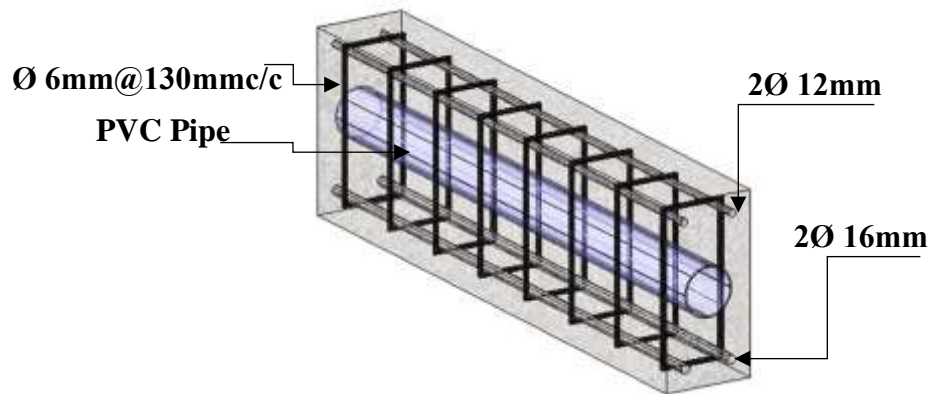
Typical Reinforcement Arrangement for all Beams.
